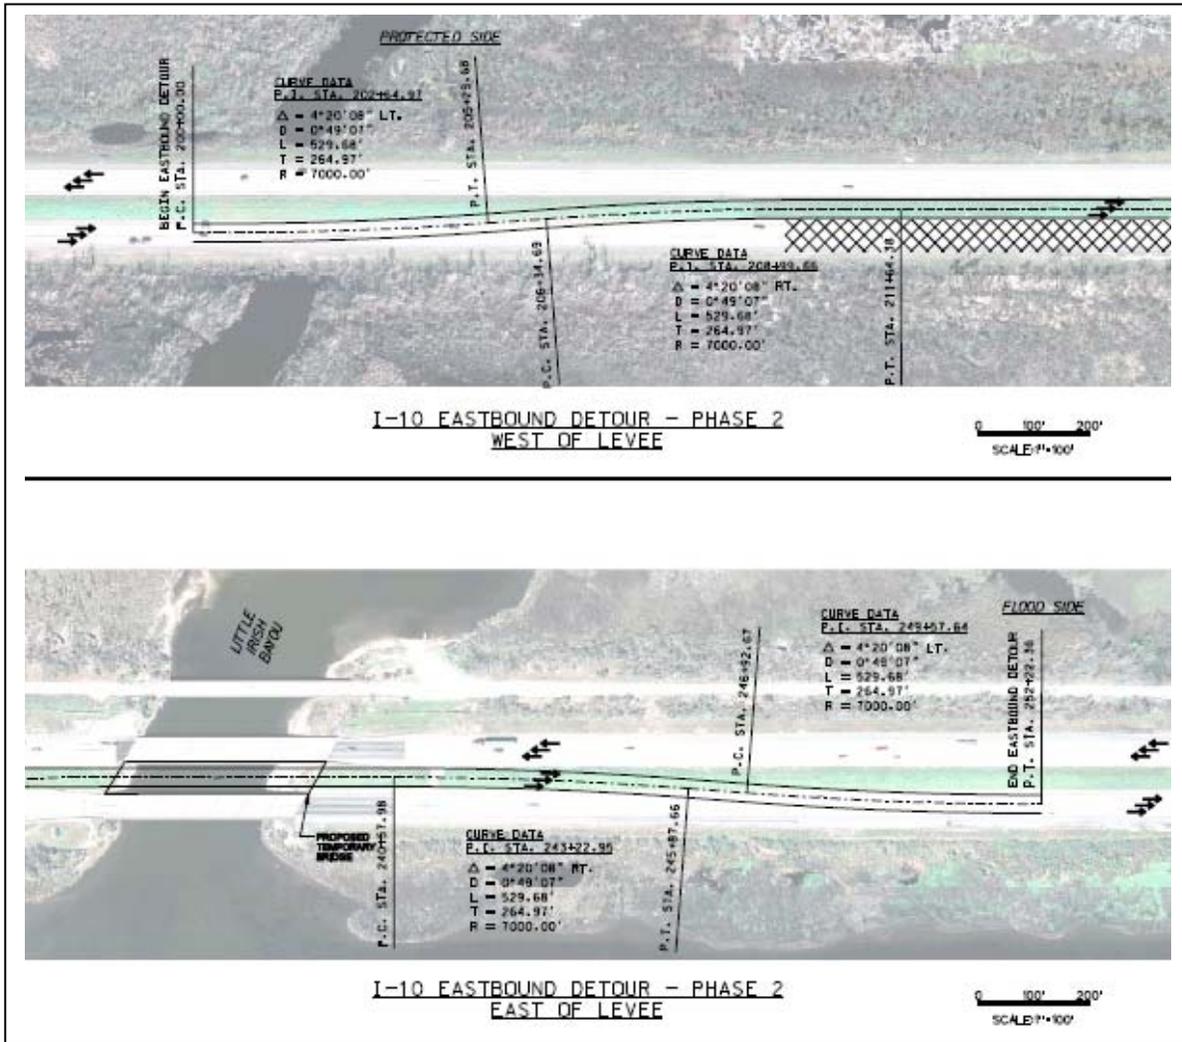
Phase 2 of I-10 ramp construction traffic detour
